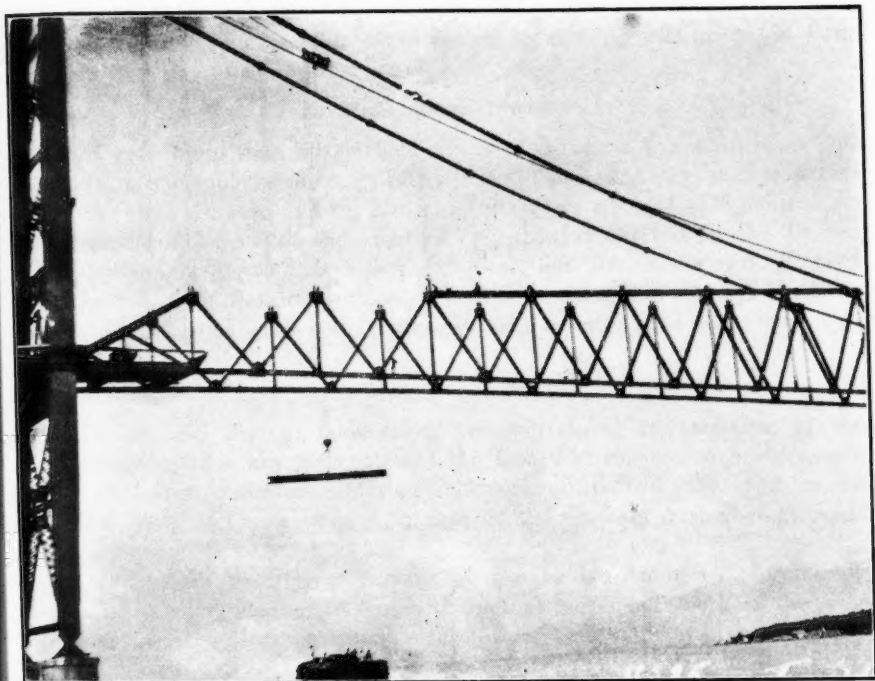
VIEW SHOWING ERECTION OF TOP CHORD, FLORIANOPOLIS BRIDGE.
